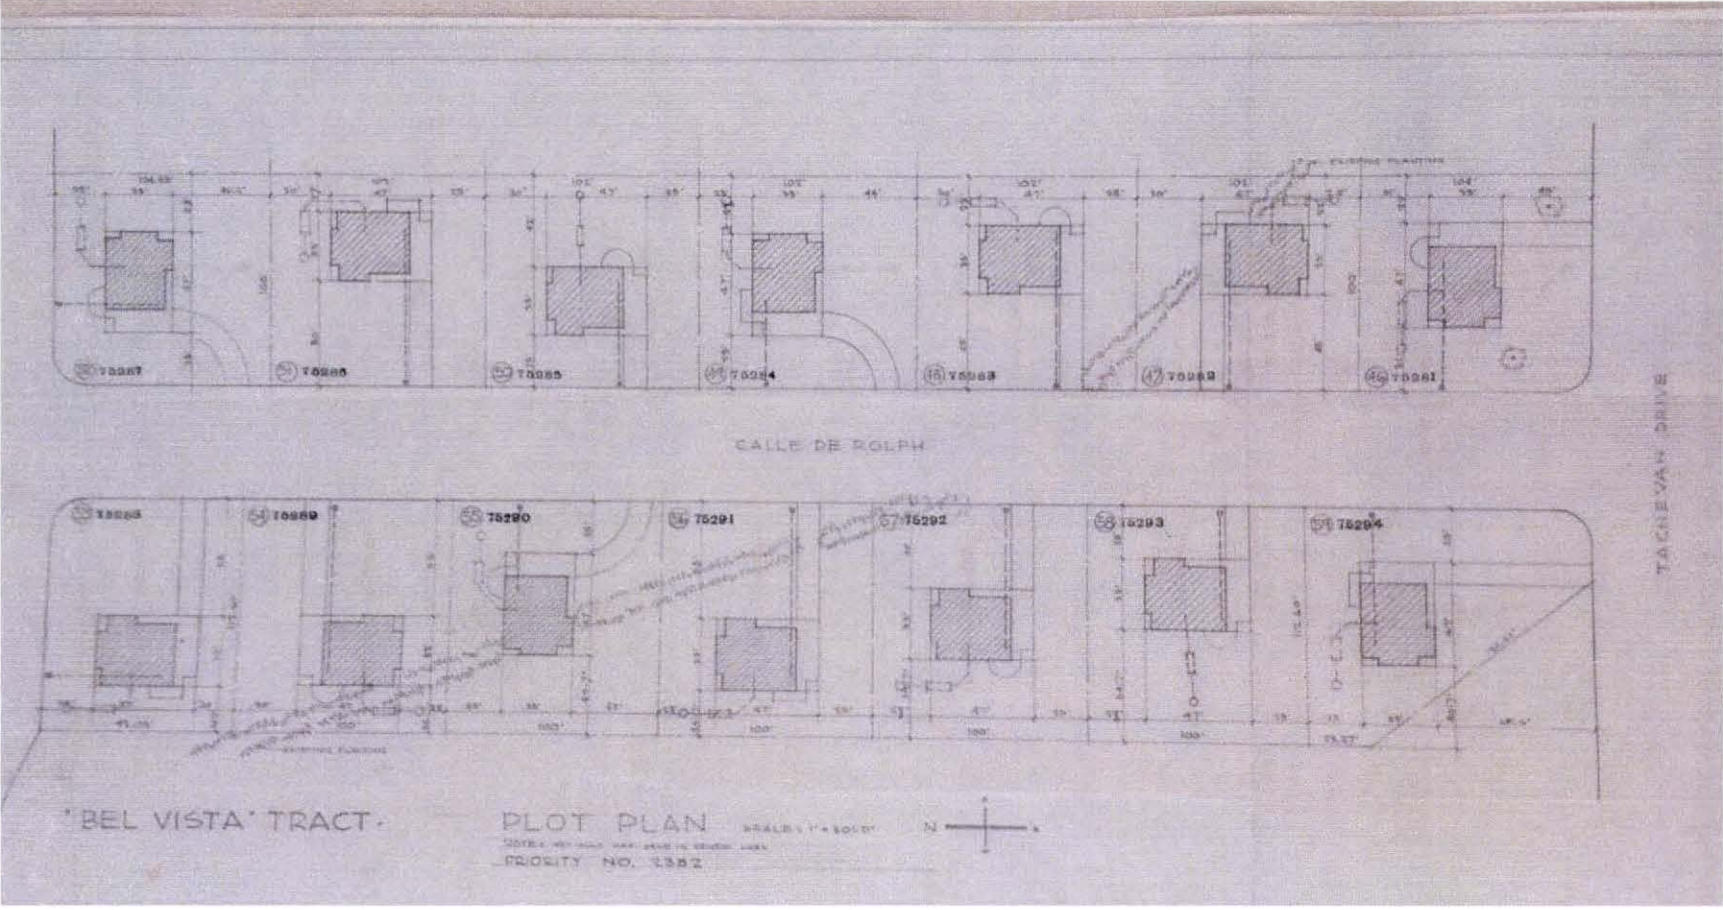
, Original Tract Plot Plan. Source: Art, Design & Architecture Museum, University of California, Santa Barbara
